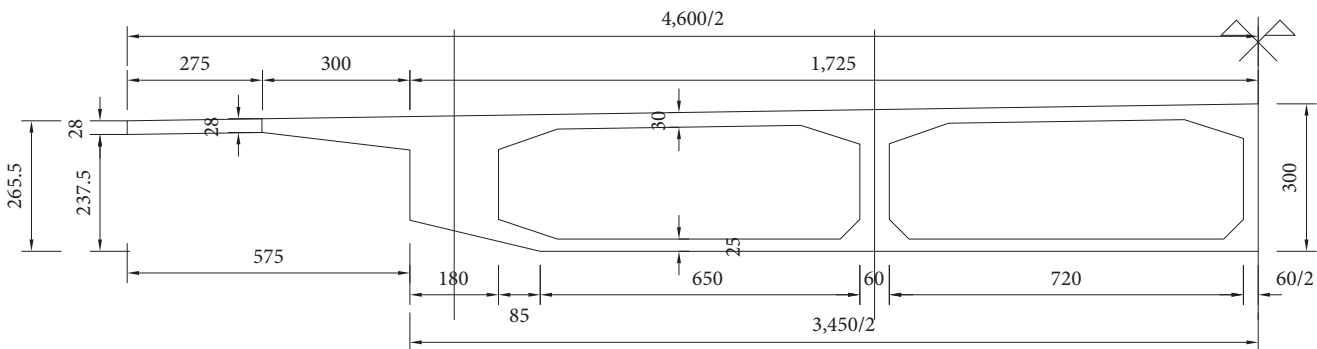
Standard cross-section of side span prestressed concrete box girder.
